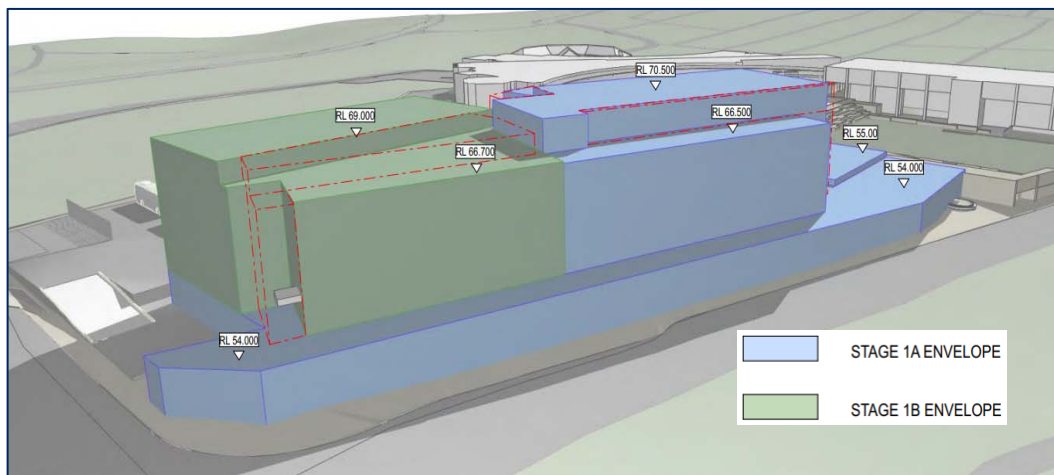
| STEAM and ILC building envelope – eastern perspective (Source: RtS)
